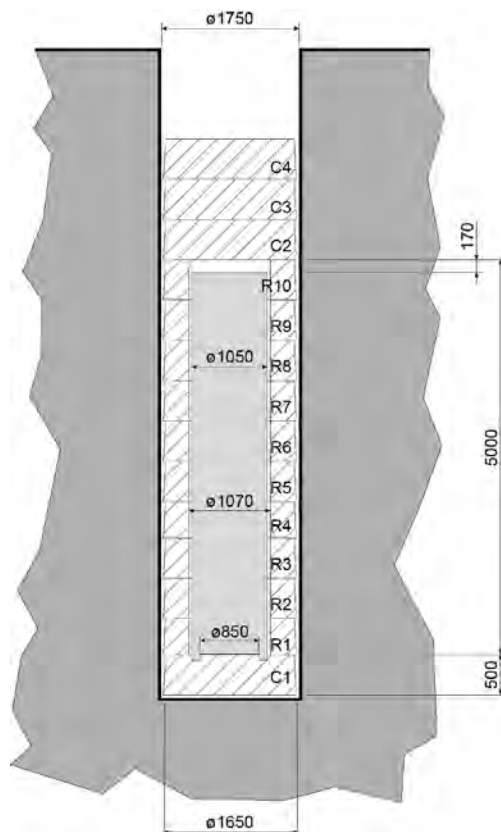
A schematic drawing of a canister hole with bentonite blocks. Each block is slightly tapered (\varnothing 1,630 mm at top and \varnothing 1,650 mm at bottom) so that the compacted block could be squeezed out from the mold. The upper ring-shaped block ends 170 mm above the doubled-layered canister lid (canister lid and cable-protecting lid on top). The space above block C4 was filled with backfill material up to the tunnel floor level. A circular groove was machined into the bottom block to accommodate the canister's extended copper shell. (After Figure 4-1 in Johannesson et al. 2004.)
